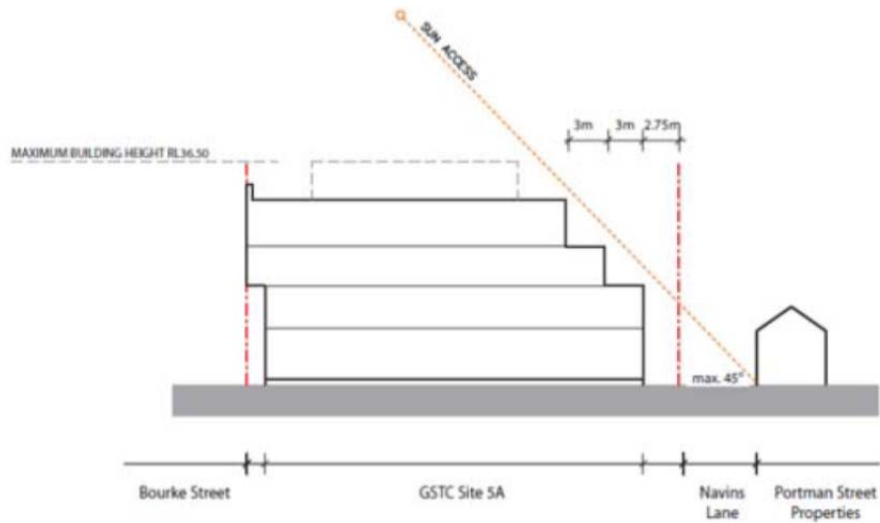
Figure 6.10 in DCP – Sun Access Plane for Site 5A north
